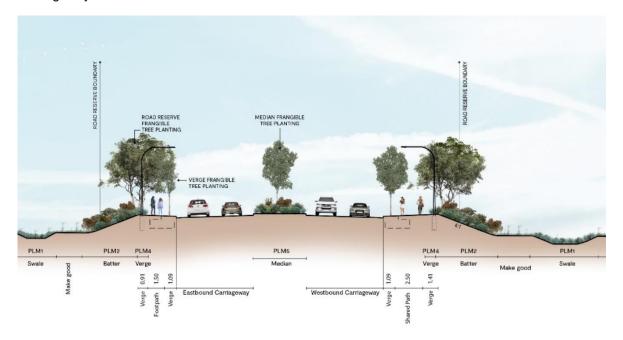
Typical section through Townson Road fill batters at CH 1460
